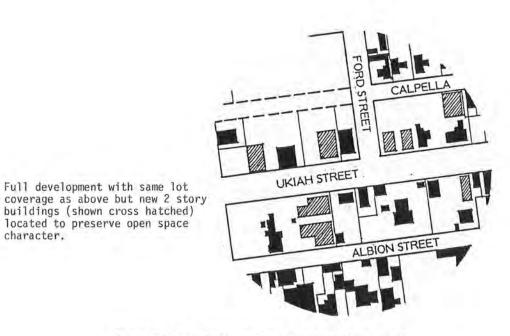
Mendocino Town Plan example of use of special site planning standards to preserve open space character without reducing allowable floor area.
